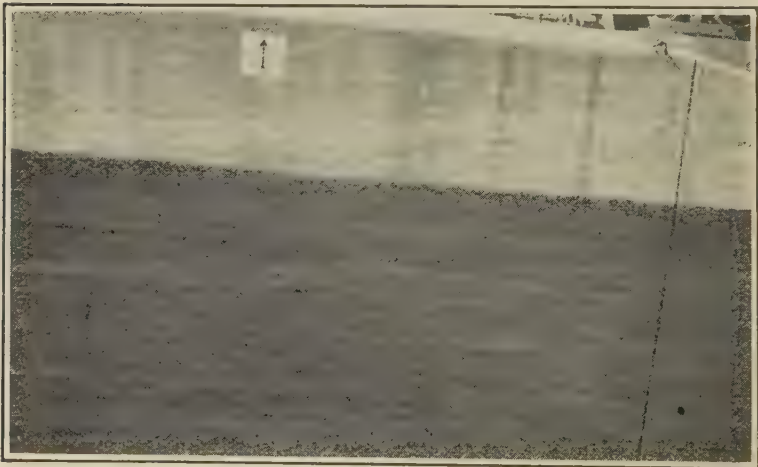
AN EXAMPLE OF A WALL IN EXCELLENT CONDITION AFTER 16 YEARS
